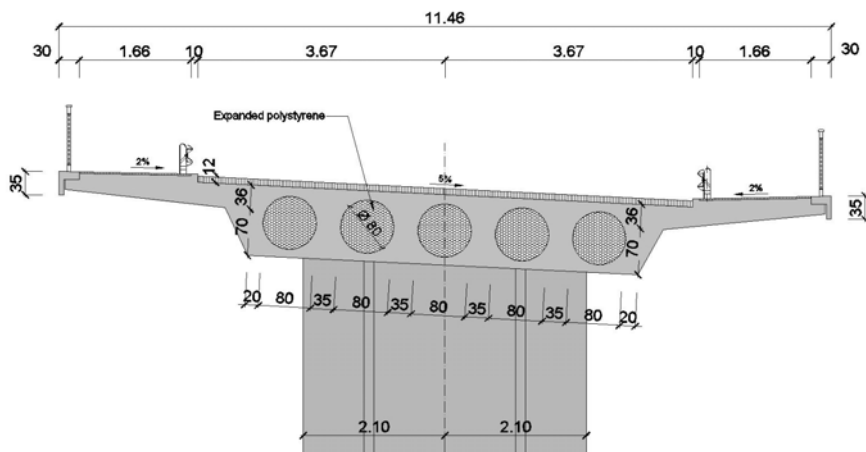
Geometry and cross-section of the existing Chandelard's bridge
